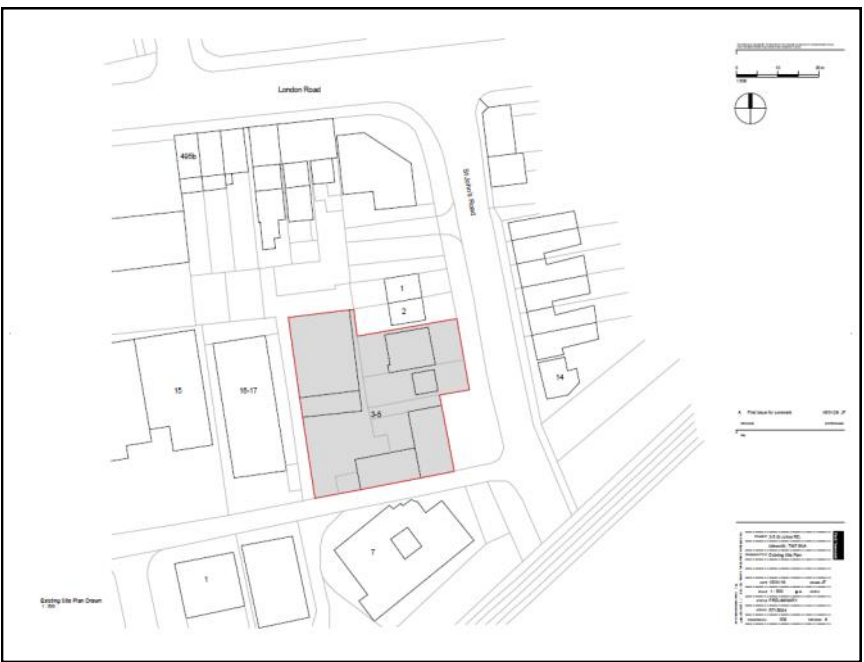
Existing site plan. Source: Rock Townsend (2016).
